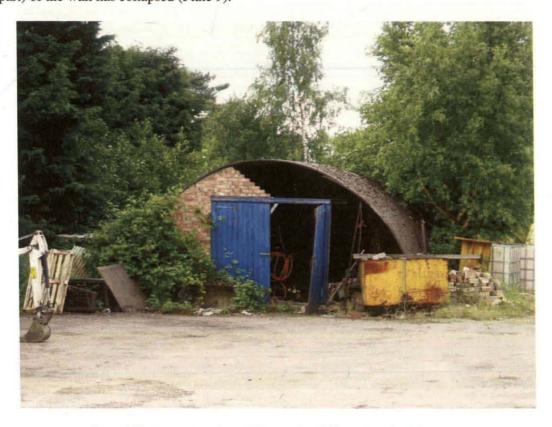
Eastern elevation of Room 2 of Nissen hut, looking west
